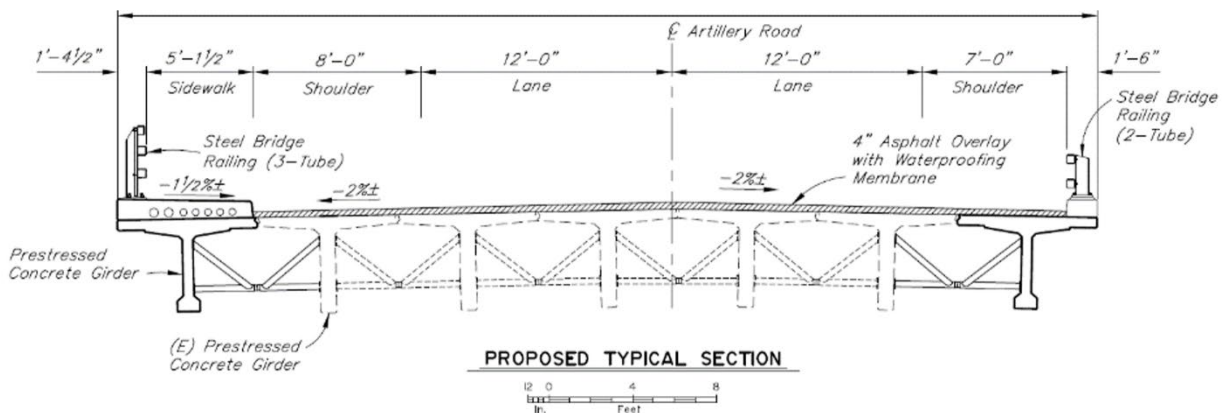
Girder Removal 71104 (Levings & Murray 2019)
